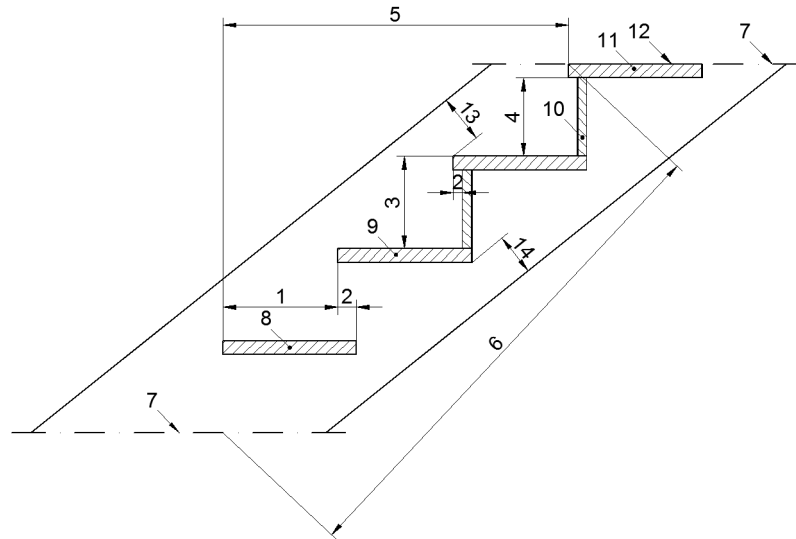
String dimensions: Last step - Ceiling - Vertical
